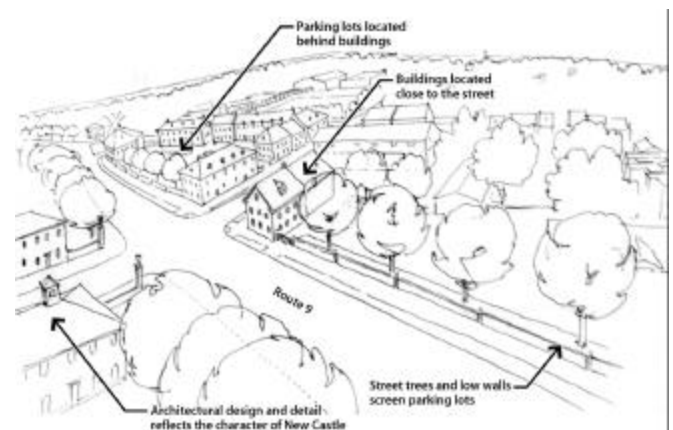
Aerial Perspective of Route 9 Urban Design Plan
